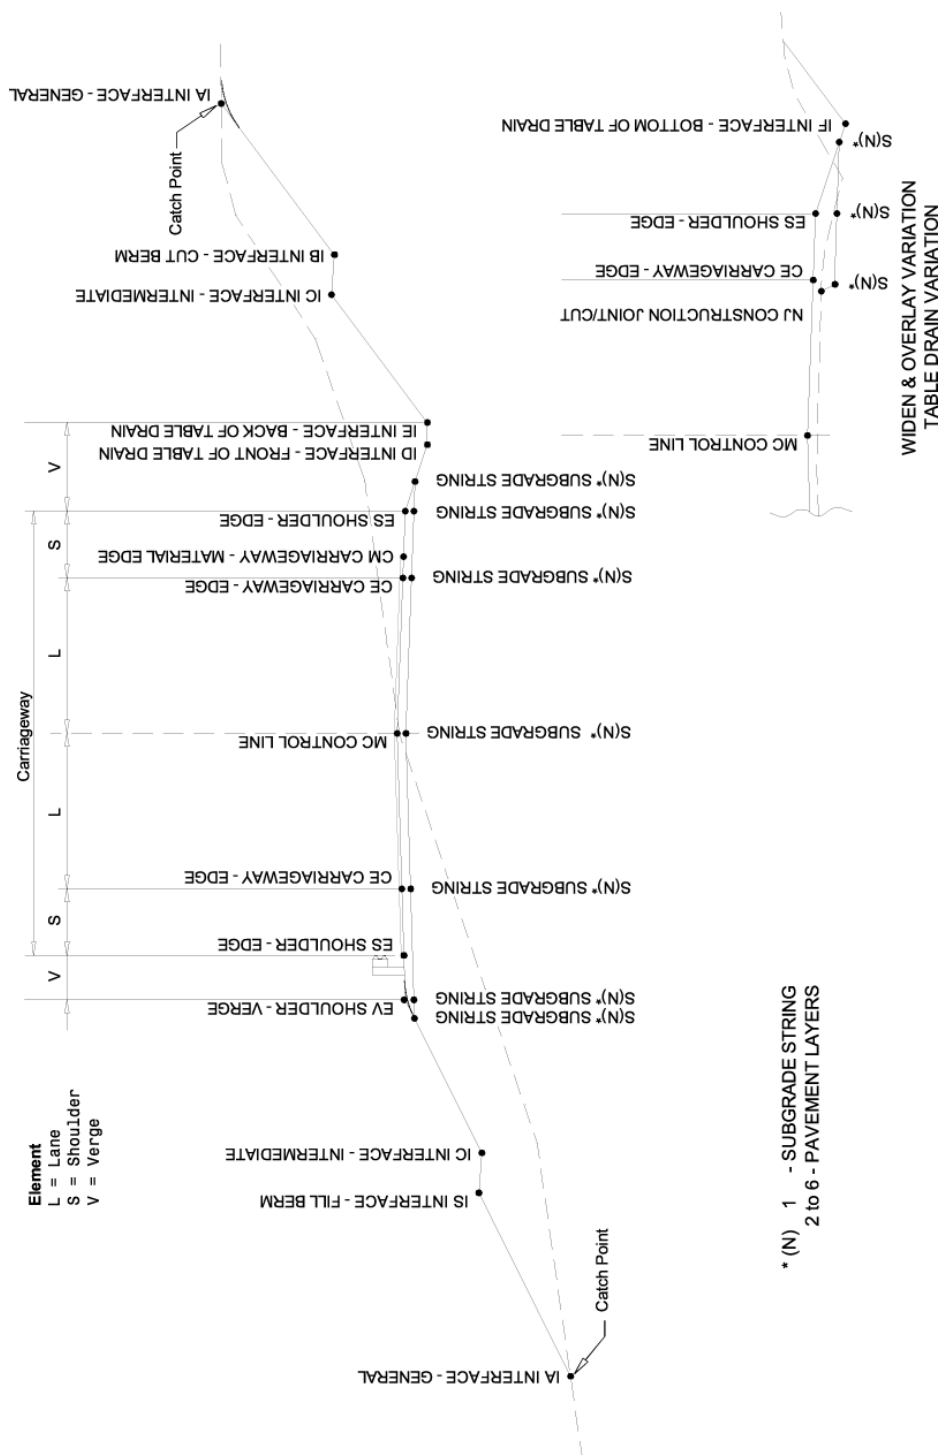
(b) – Typical cross section of multilane rural road – independently aligned
